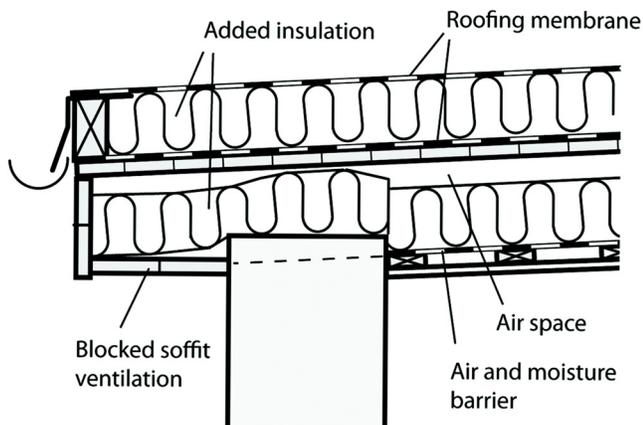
Example of insulation added on top of original roofing membrane and blocked ventilation.
